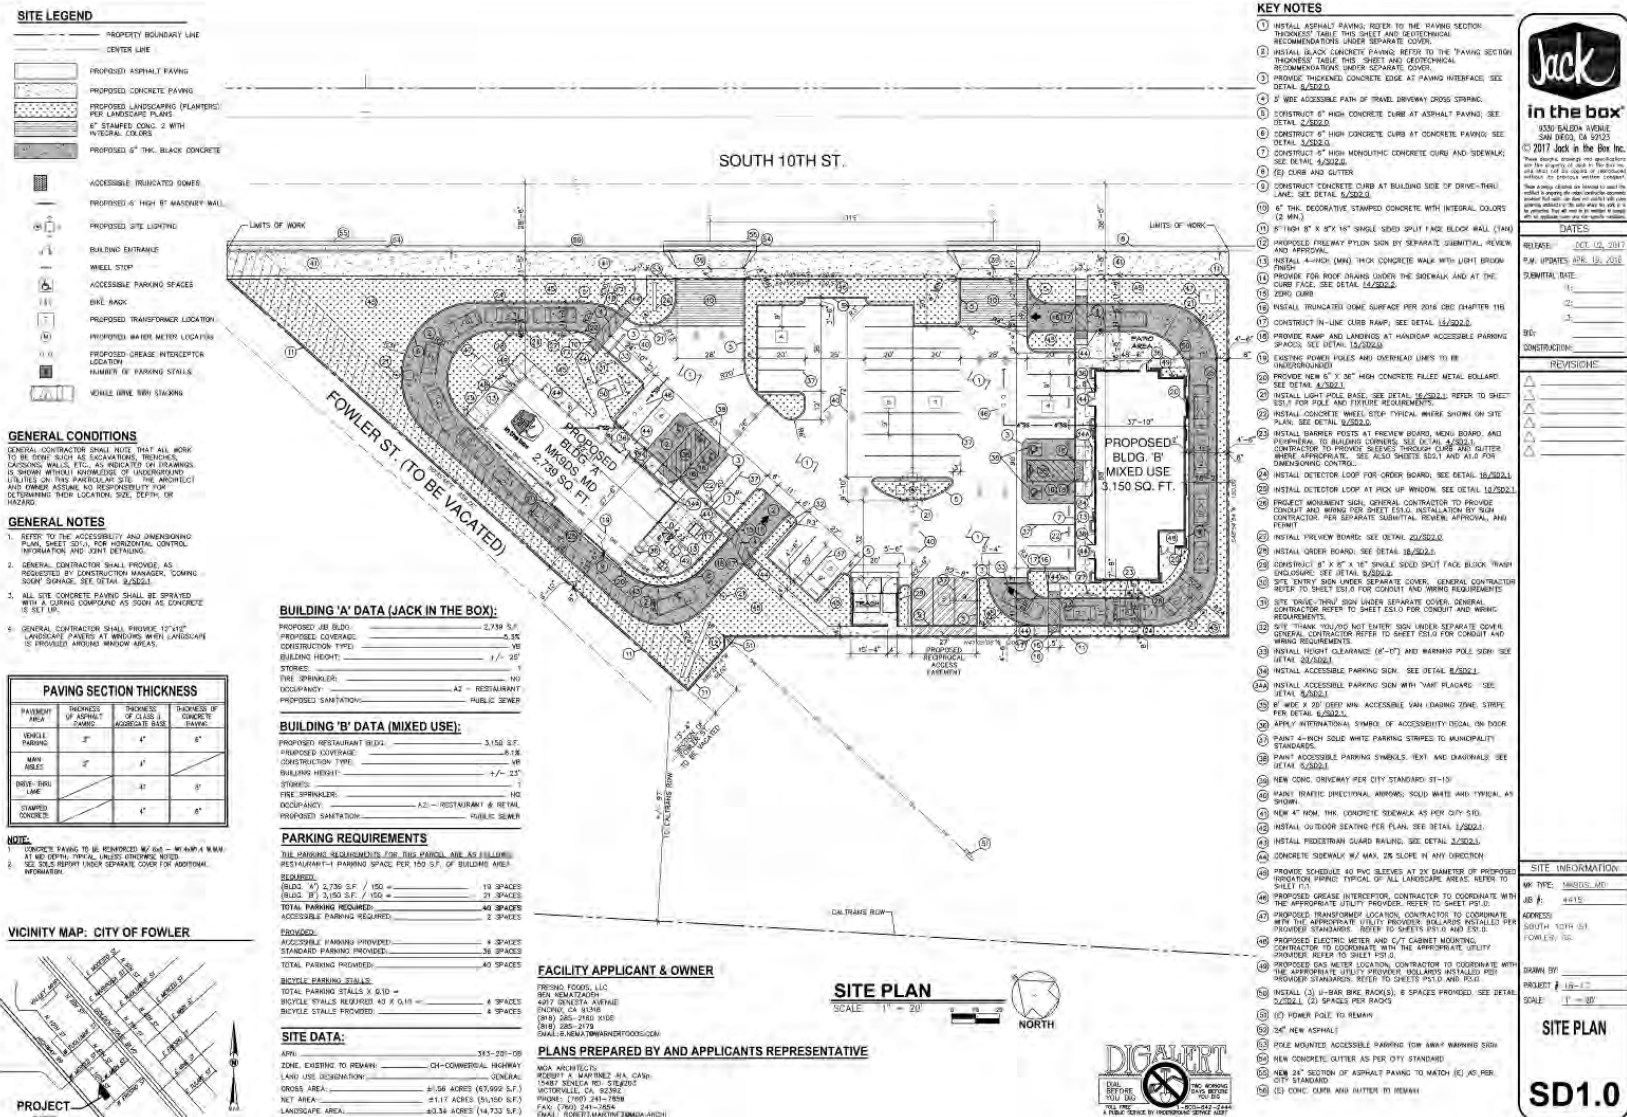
CONDITIONAL USE PERMIT NO. 18-04 APPROVED SITE PLAN
